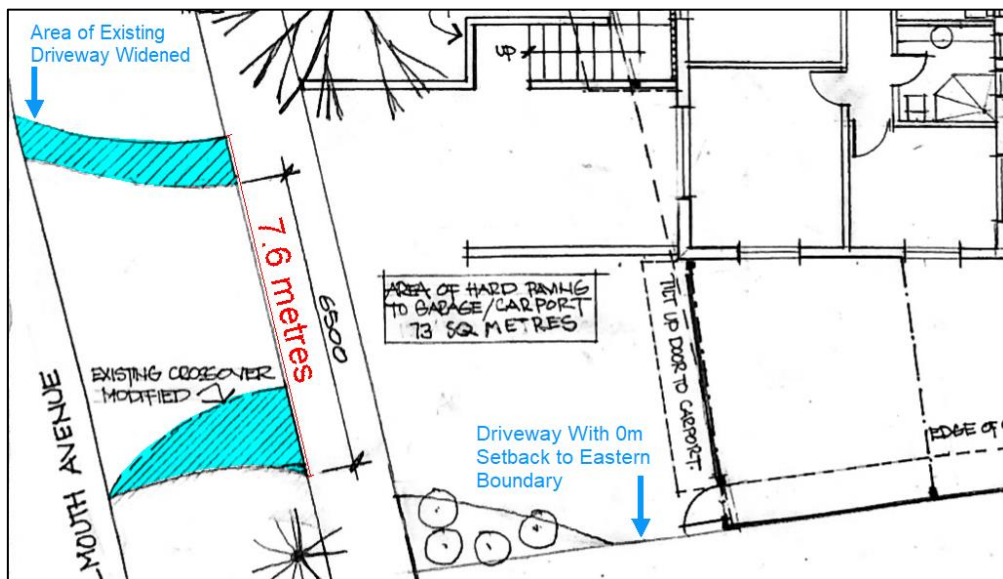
Marked-up floor plan showing proposed increased crossover width of 7.6m (not inclusive of splays) and the proposed additional driveway area with a nil setback to the eastern boundary.
